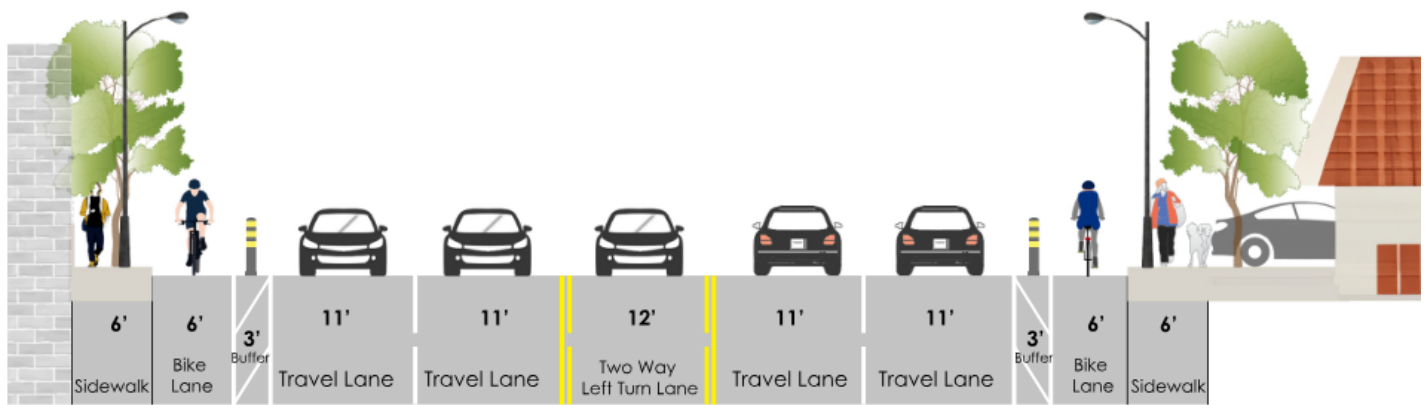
Wilcox Avenue Bike Lanes Cross Section
